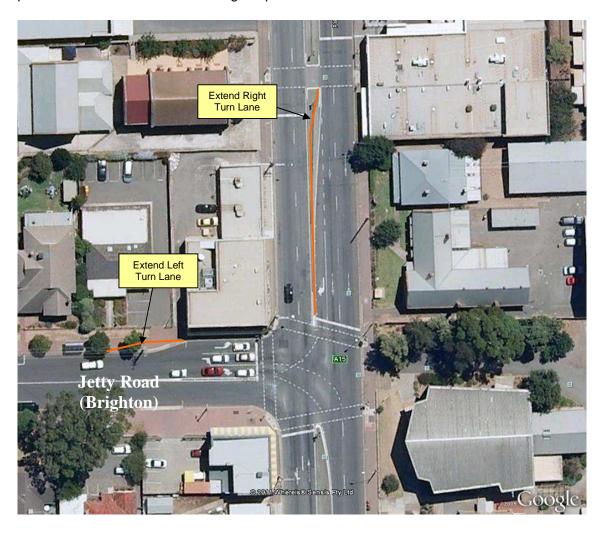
Proposed Brighton Road / Jetty Road (Brighton) Improvements
